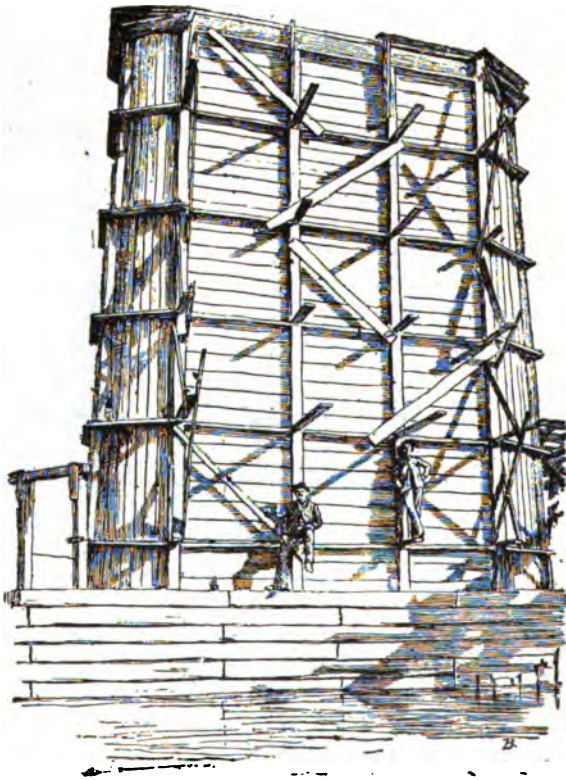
CONCRETE FORMS, RED RIVER BRIDGE.
